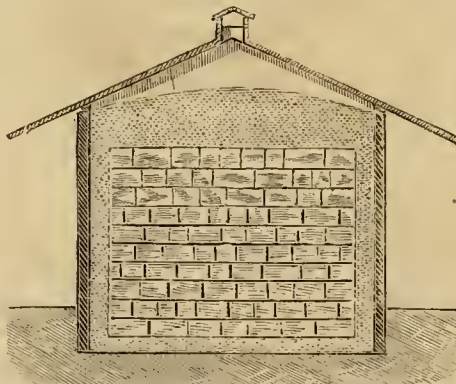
SECTION OF ICE-HOUSE FILLED.
